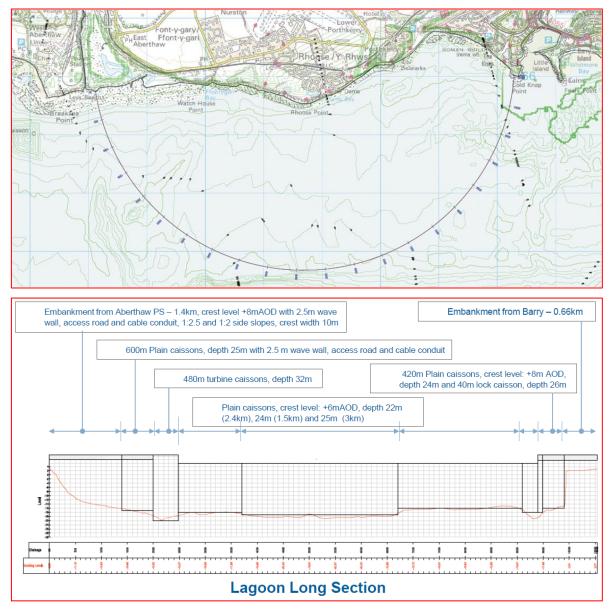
Stepping Stones Tidal Lagoon Plan and Elevation.
